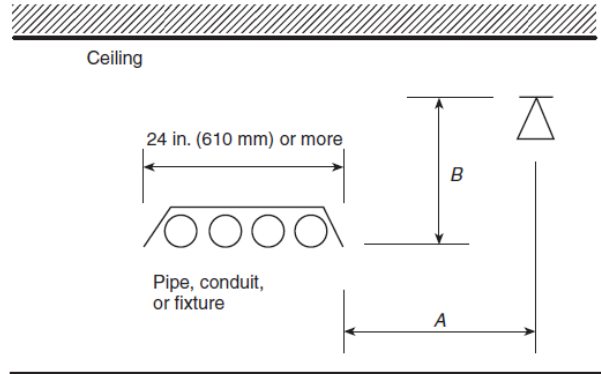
Obstruction Entirely Below the Sprinkler (CMSA Sprinklers).
